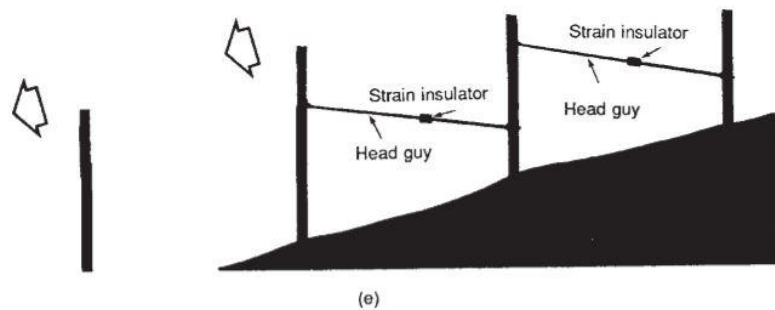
(e) Head guys counteract the pull on poles installed on a steep hillside.
